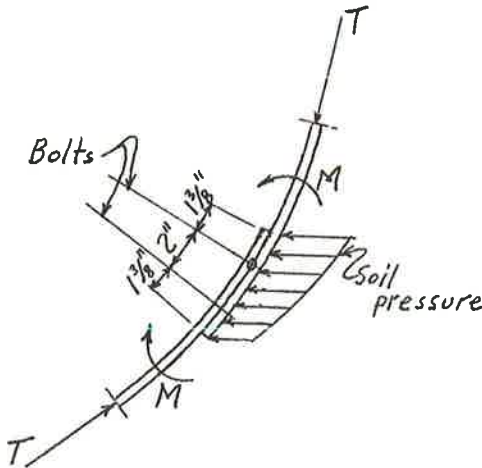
Forces on bolted seam—Wolf Creek culvert.
